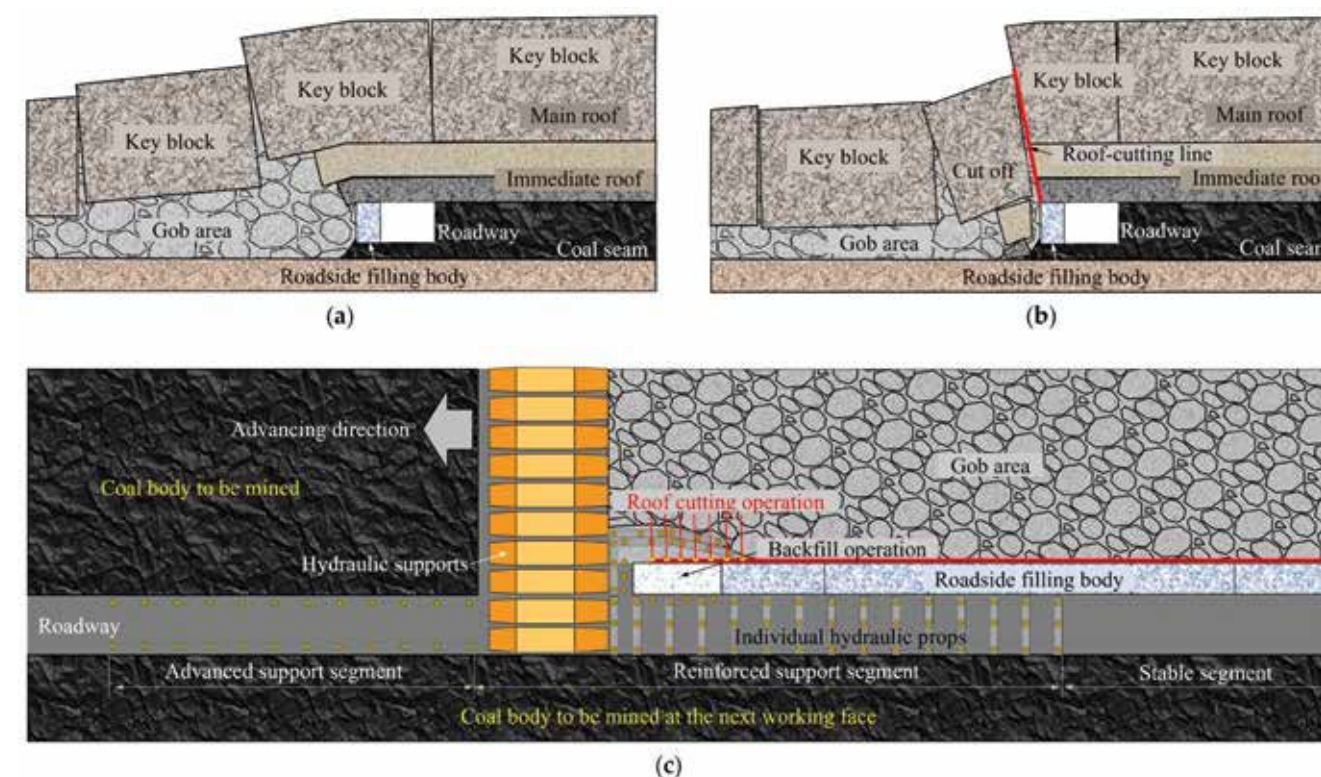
Delayed pre-splitting and cutting roof for gob-side entry retaining. (a) Gob-side entry retaining with backfill (b) Cutting roof on goaf side (c) Working methods of roof-cutting and gob-side entry retaining with backfill.
